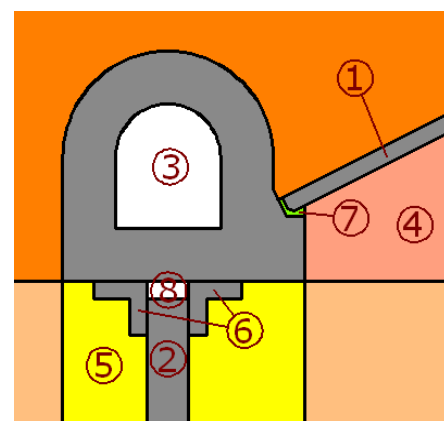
Scheme of conjugation for seepage-control elements 1 – reinforced concrete face, 2 – wall, 3 – gallery, 4 – under-face zone, 5 – sand core, 6 – foreshaft, 7 – filling the perimeter joint, 8 – air cavity
